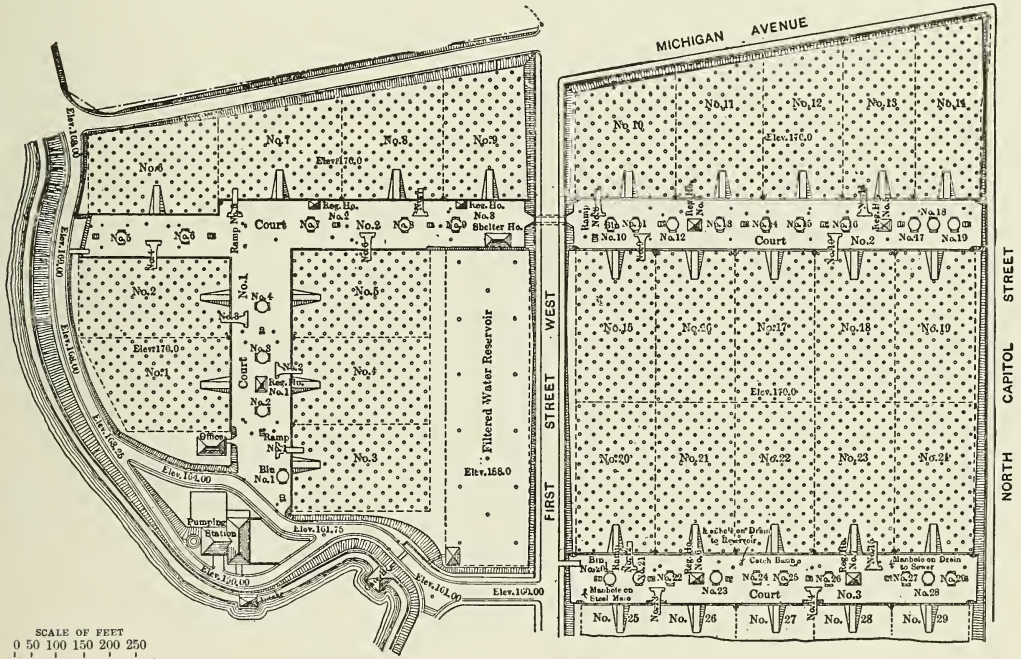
General Plan of Filtration Plant, Washington, D. C.
